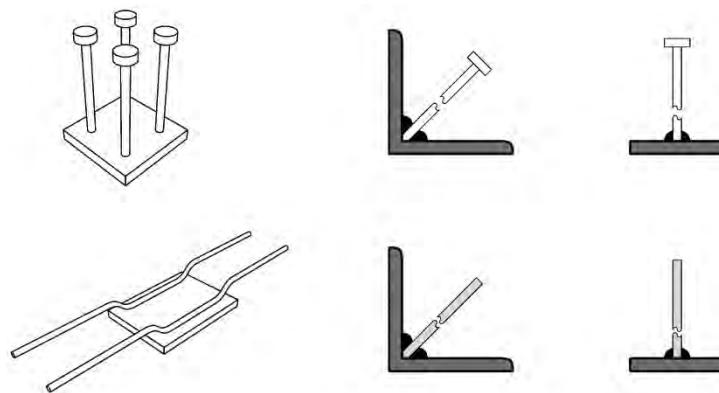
Anchorage of weld plates by ribbed anchor bars or smooth bars with end anchors
